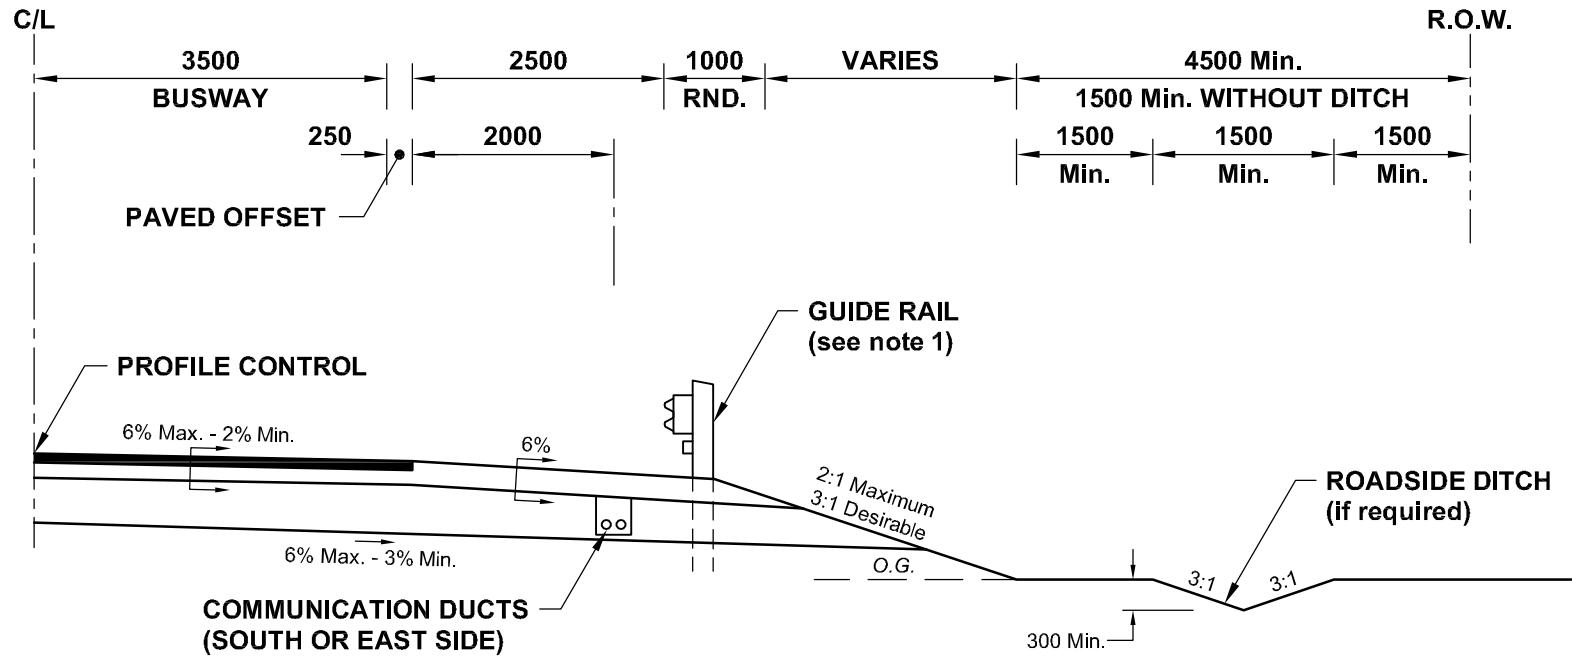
TYPICAL TRANSITWAY RURAL CUT SECTION
